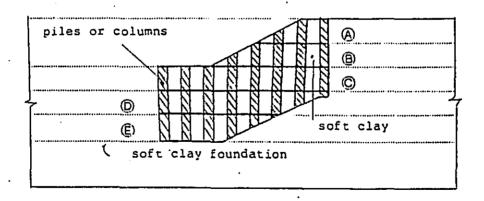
Excavated slope improved by sand compaction piles or cement columns
